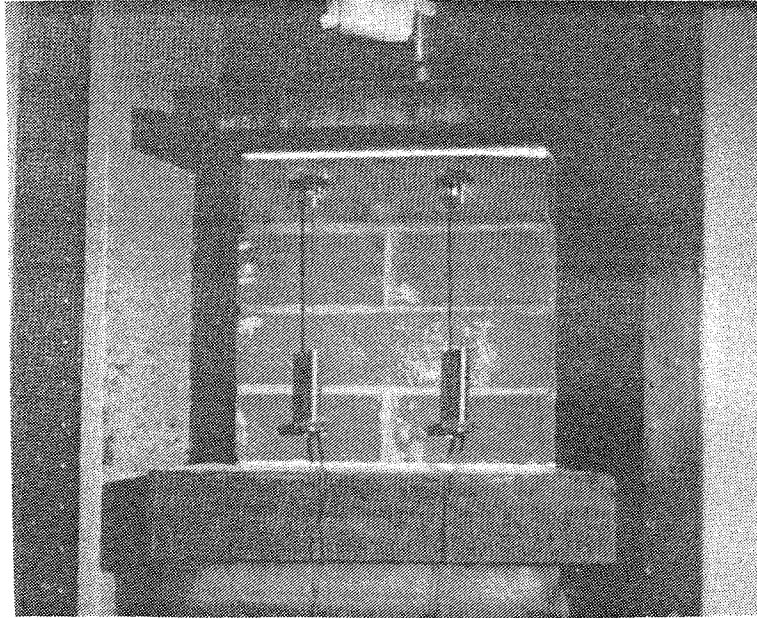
PRISM IN PLACE IN TEST MACHINE
